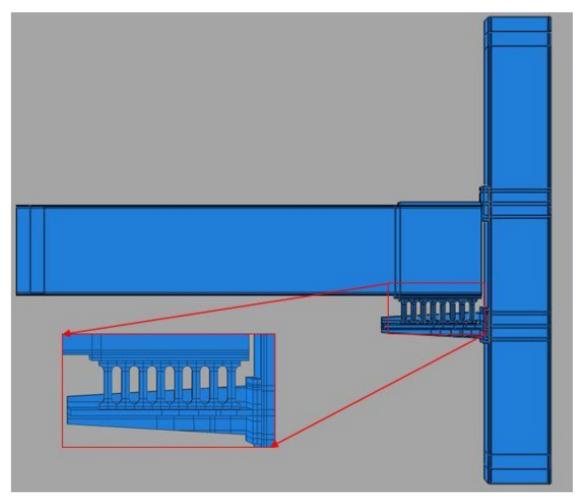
Assembled model of the beam-to-column connection by placing a slit metallic damper under the beam
